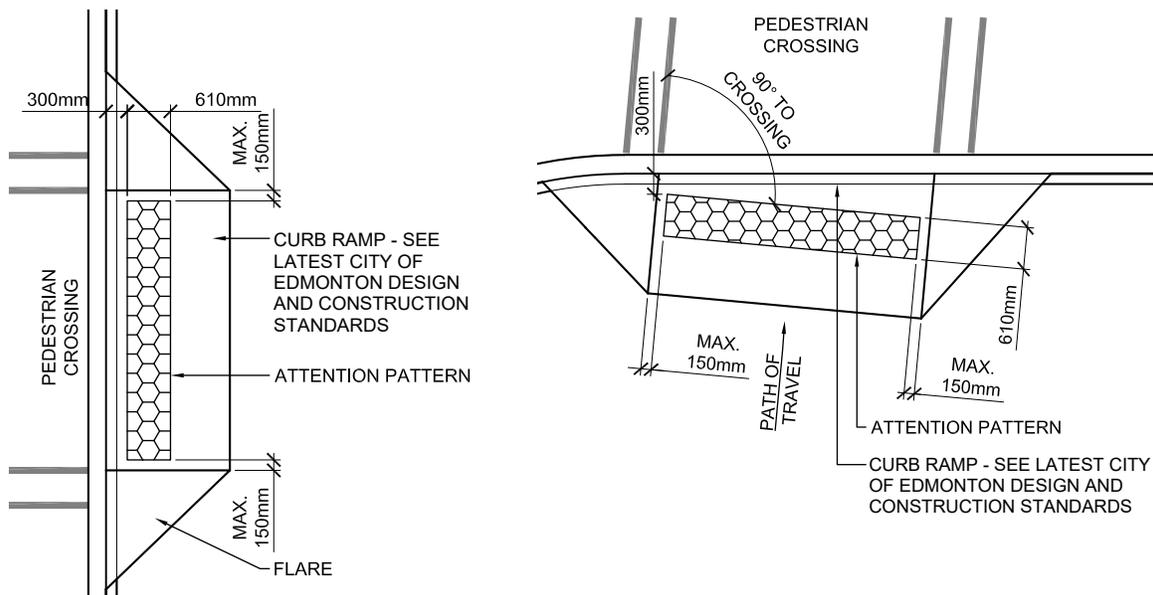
Typical TWSI layout at perpendicular and non-perpendicular crossing.
